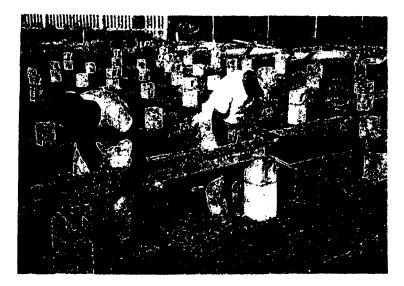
PLACING PRECAST CONCRETE BEAMS ON CONCRETE-BLOCK PEDESTALS
